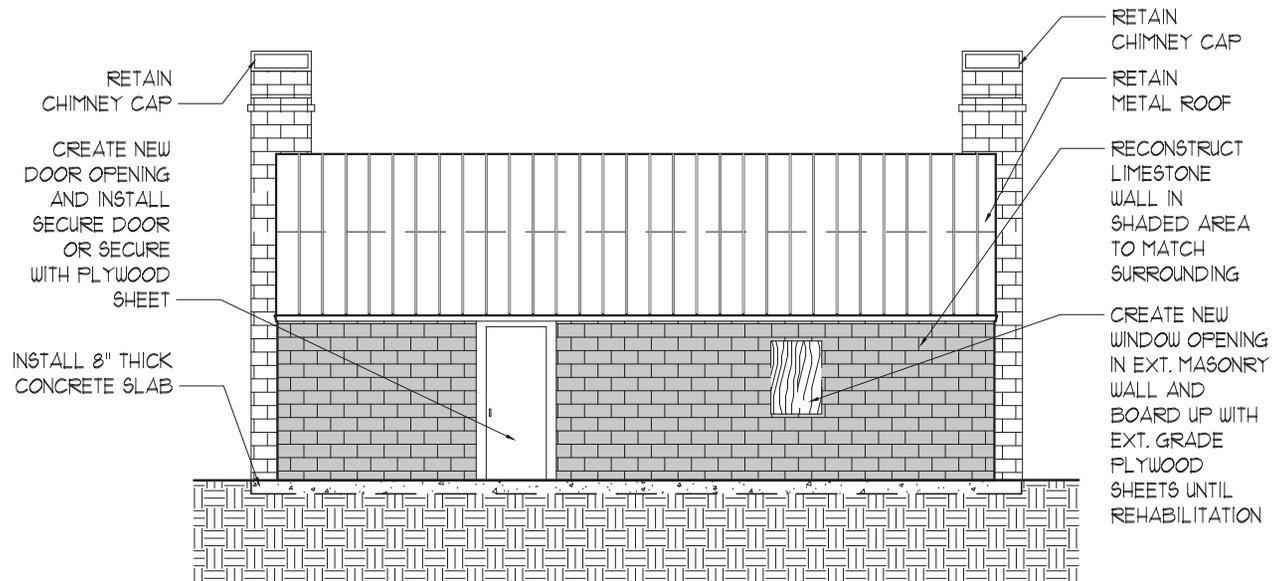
Elevations for Stabilization/Mothballing of East Elevation, after relocation to new site
